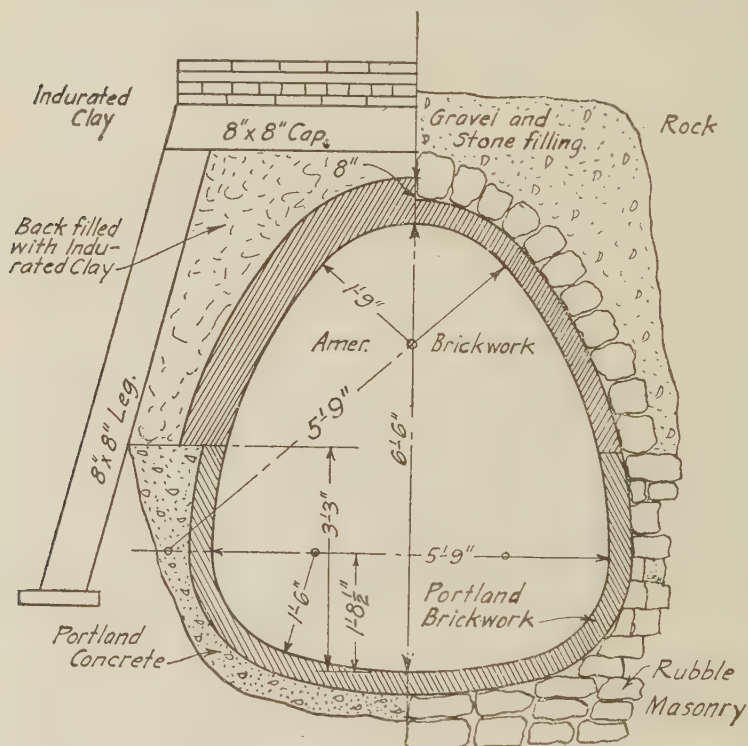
TYPICAL CATENARY SECTION USED IN MASSACHUSETTS.
